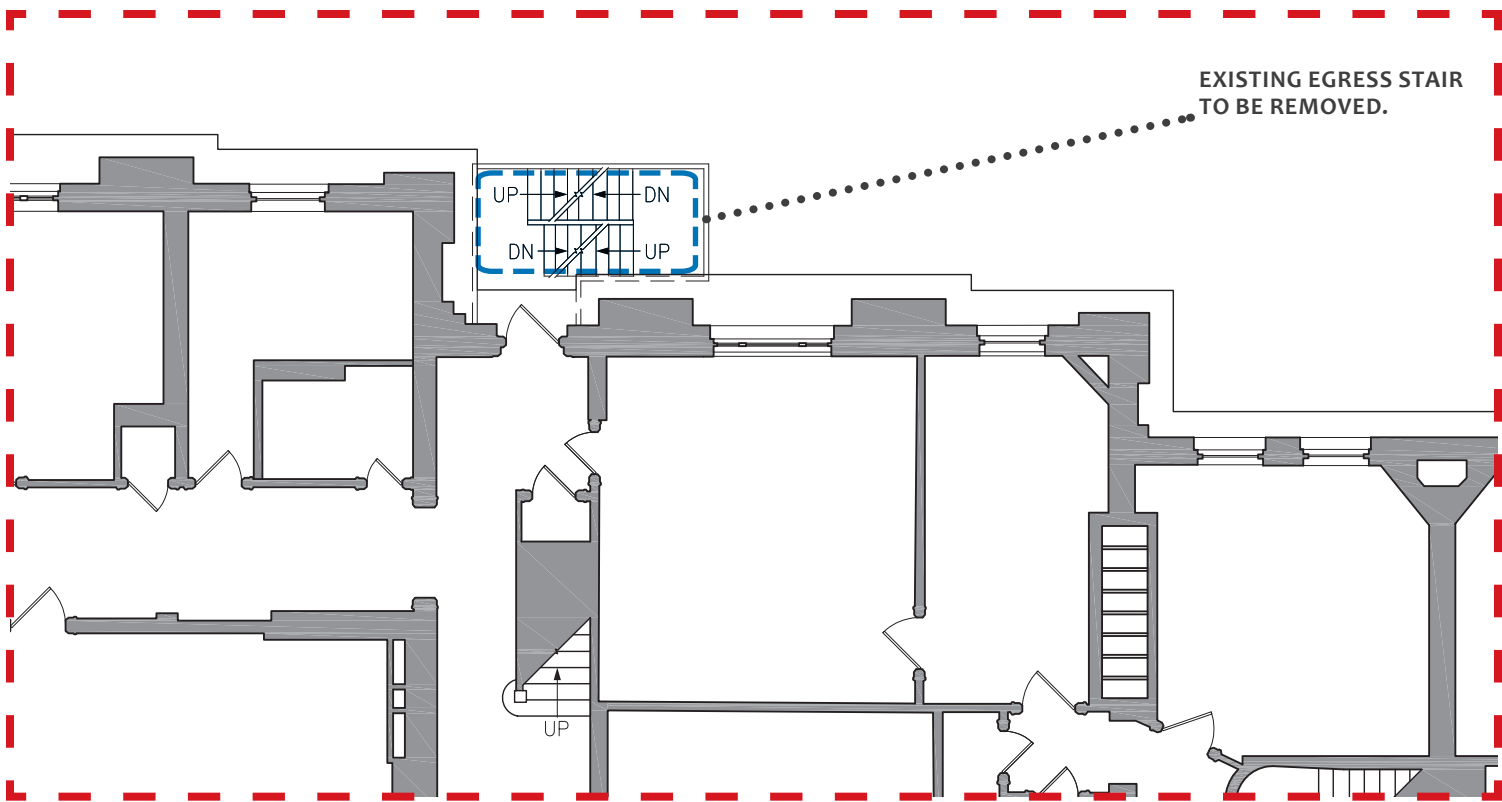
Enlarged “As-Found” Basement Level Plan and the Northwest Exterior Egress Stair.
